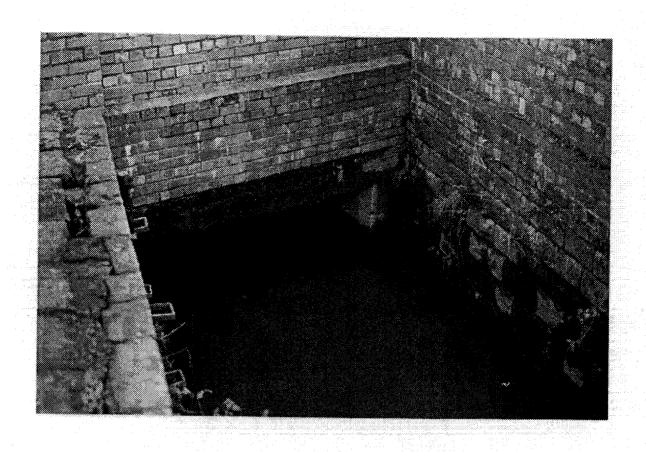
CULVERT No.18 (Inlet above - Outlet below)
